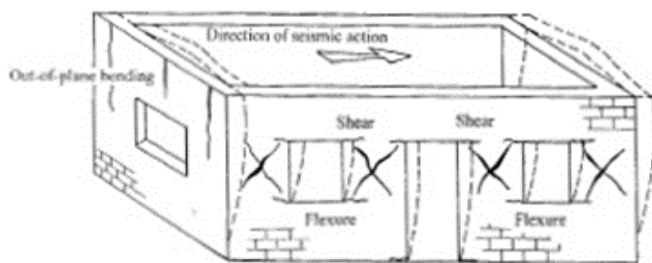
Deformation of the building and typical damage to the structural wall [2]
